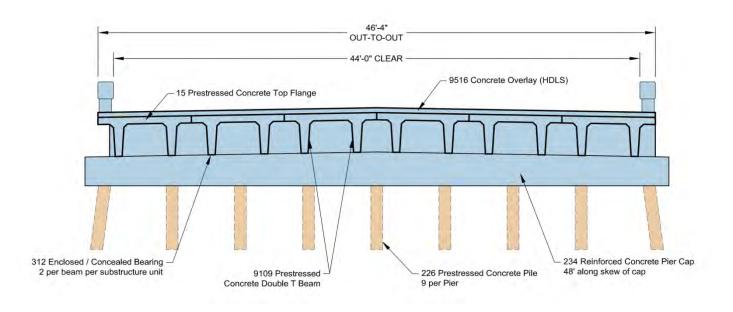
EI.24.7- 3: Cross section view of superstructure for continuous prestressed concrete Double T Beam bridge
